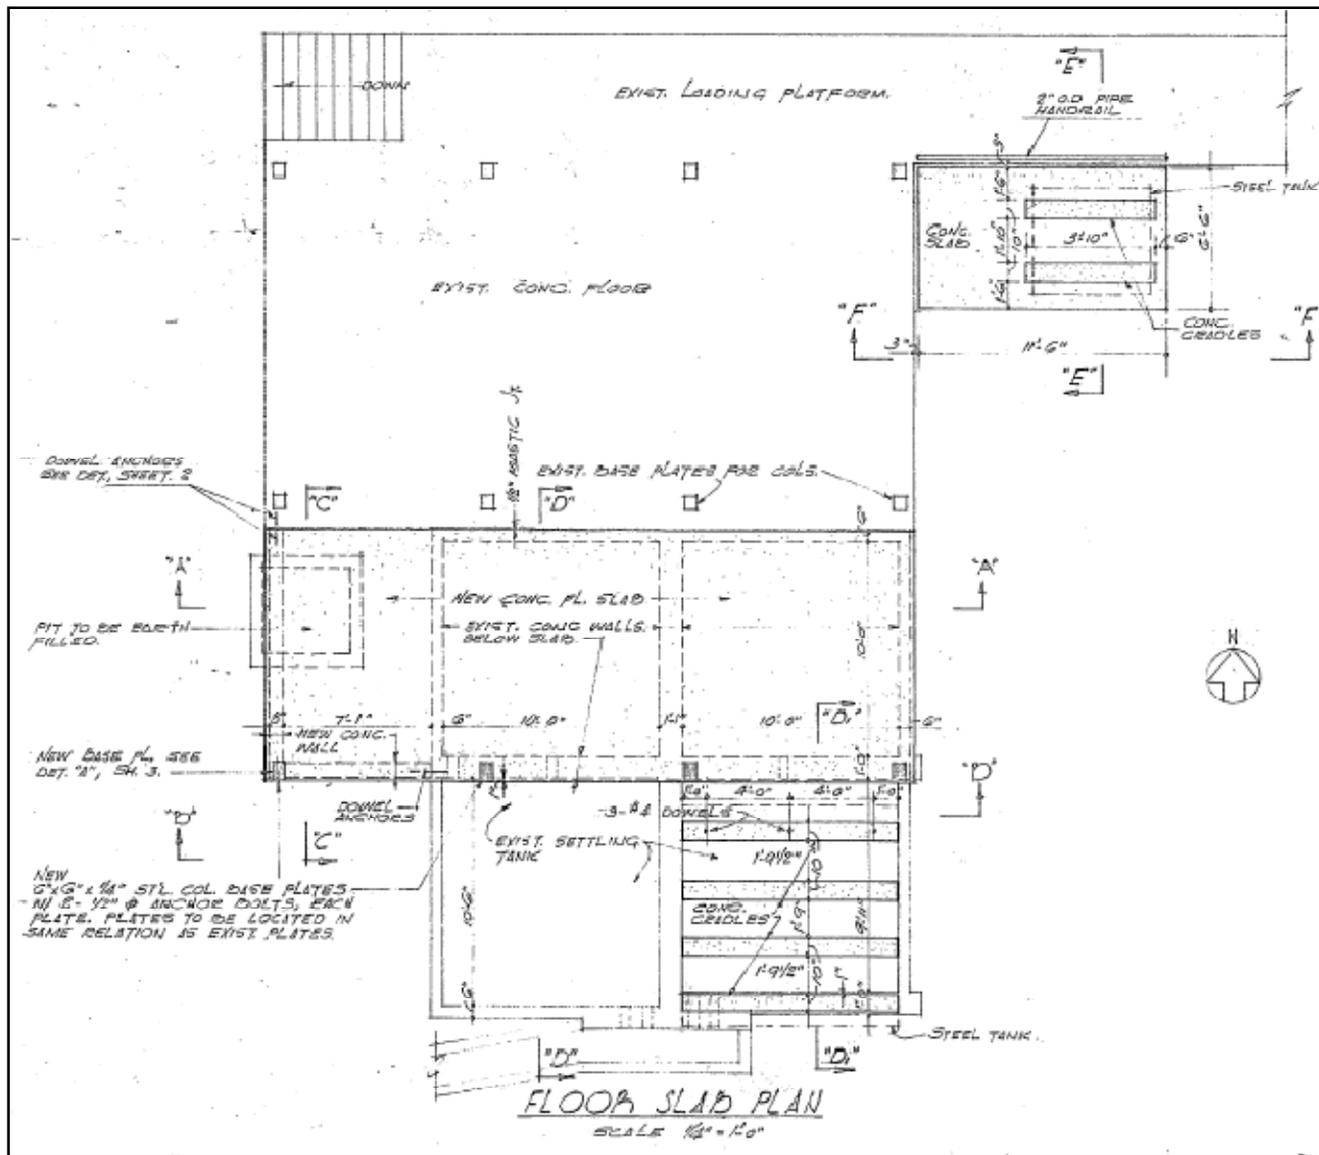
1958 Engineering Diagram Showing Concrete Basins at Building 98
